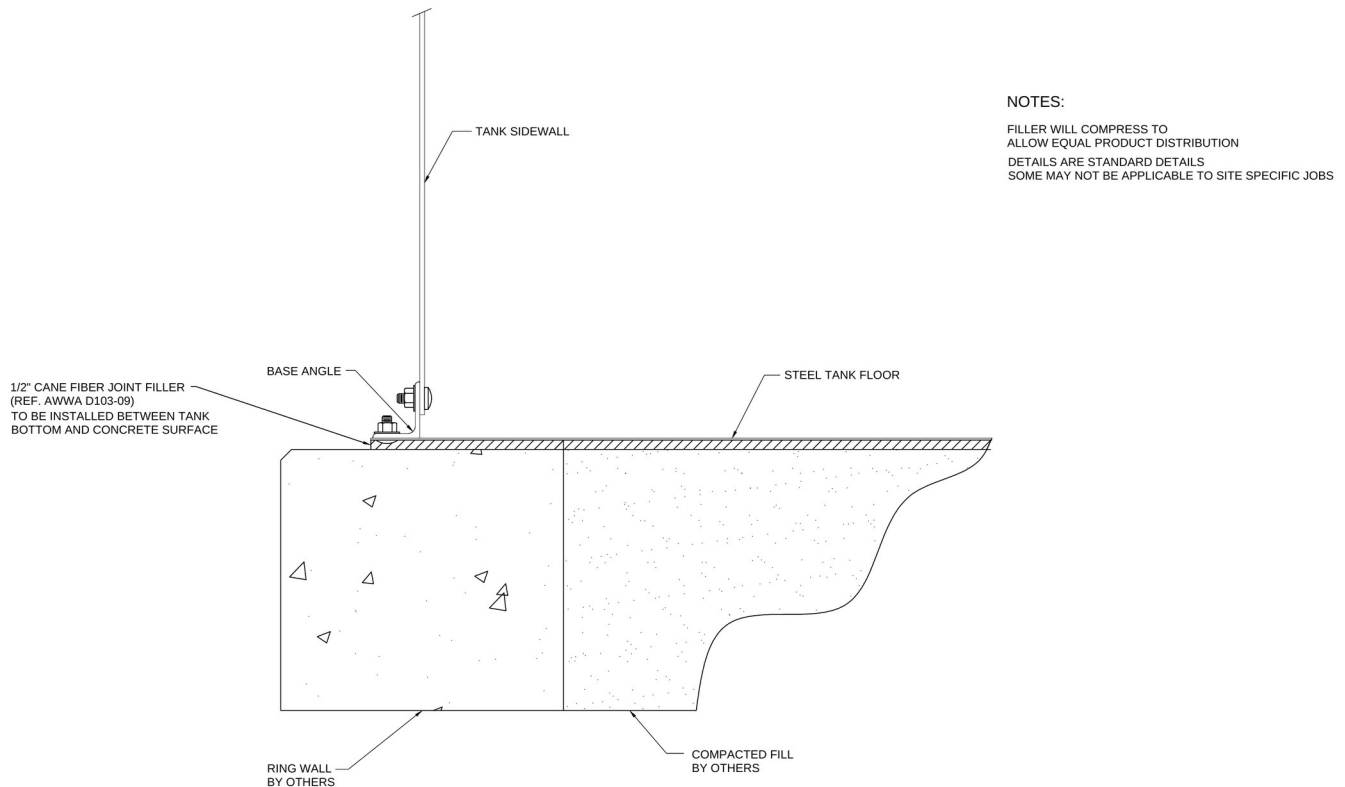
Type 1 foundation standard detail — steel-bottom tank on a concrete ringwall with cane-fiber joint filler under the shell: 3-in. minimum sand or fine-stone cushion, 1/2-in. × 6-in. ASTM D1751 filler on a cleaned and wetted foundation top, 2 % slope away from the shell, ringwall depth to the D103 frost requirement, and the levelness tolerances of Sec. 13.6.1 as a condition of using the option. Standard detail, for reference only.
